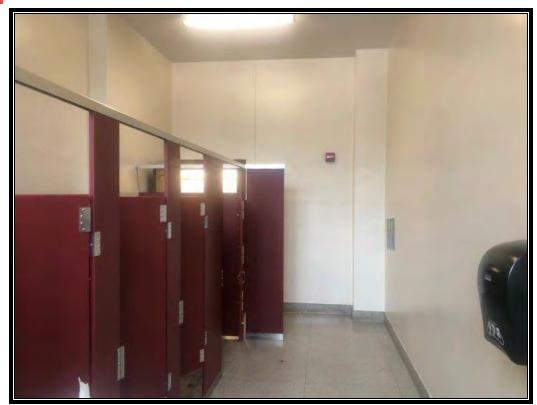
Non-ACM Wall Plaster and Ceiling Plaster
